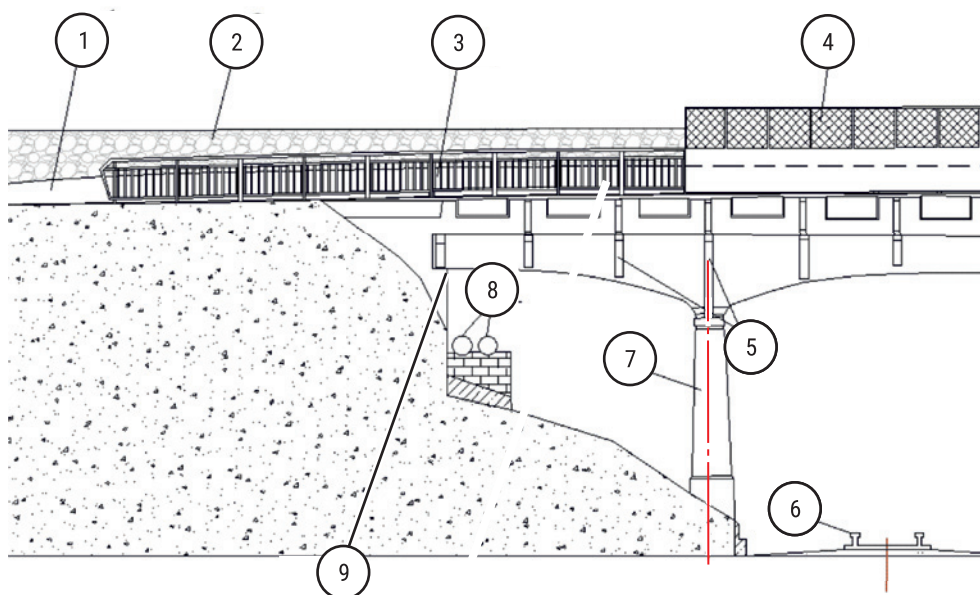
The facade of the flyover: 1 – reinforced concrete barrier fence; 2 – reinforced concrete communication box; 3 – railing fence; 4 – protective shields; 5 – reinforced concrete ribs of the superstructure; 6 – railway track; 7 – support posts; 8 – metal pipes in the casing; 9 – support body
